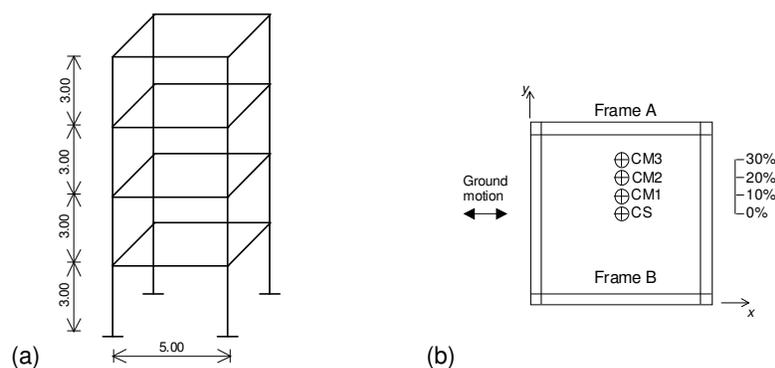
Structures under study: view (a) and plan with considered positions of CM (b).
